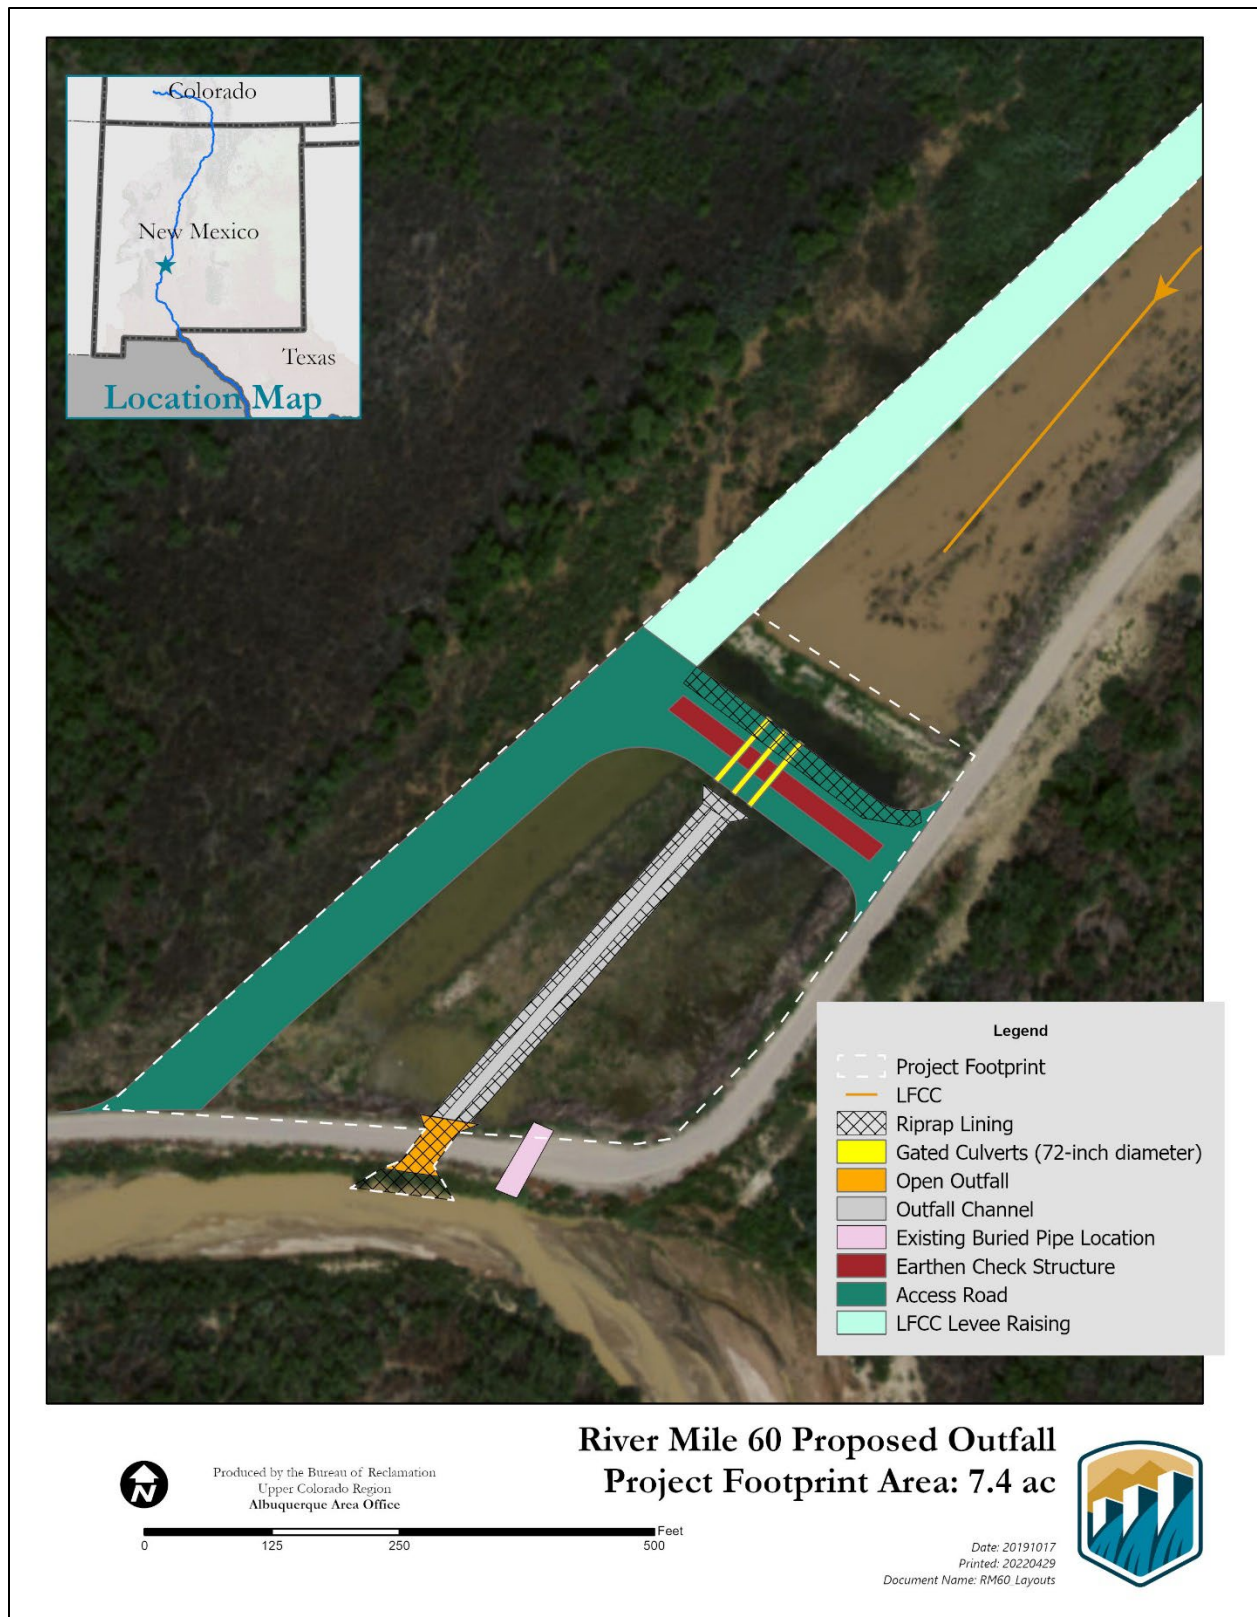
River Mile 60 (RM 60) Proposed Outfall project elements plan view.
